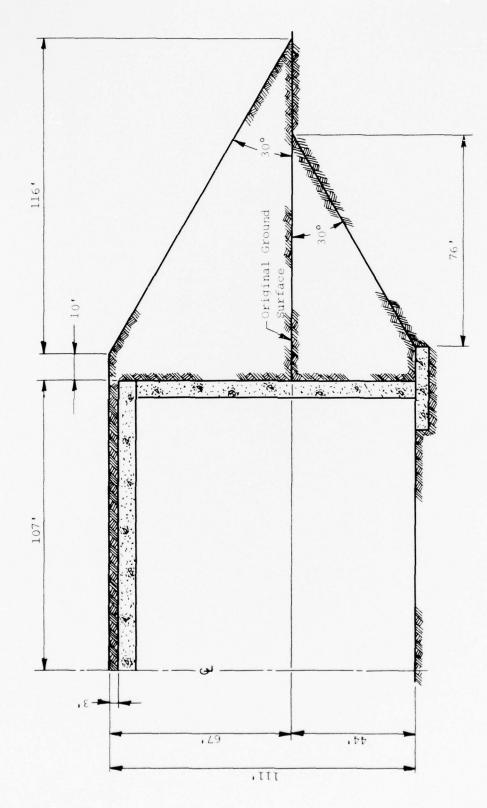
Aboveground Condition for 200-Foot Span Rectangular Section
